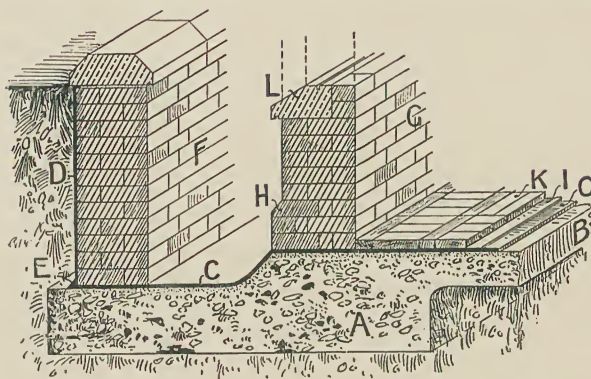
Concrete Ground-layer, Open Area, &c.
